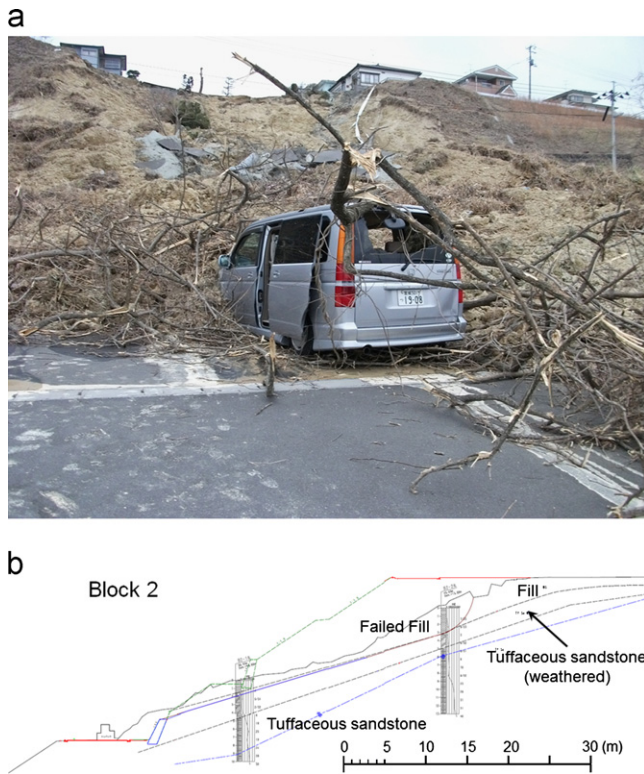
(a) View of slope failure in Block 2 from parking lot below and (b) cross-sectional profile of failed slope in Block 2.
